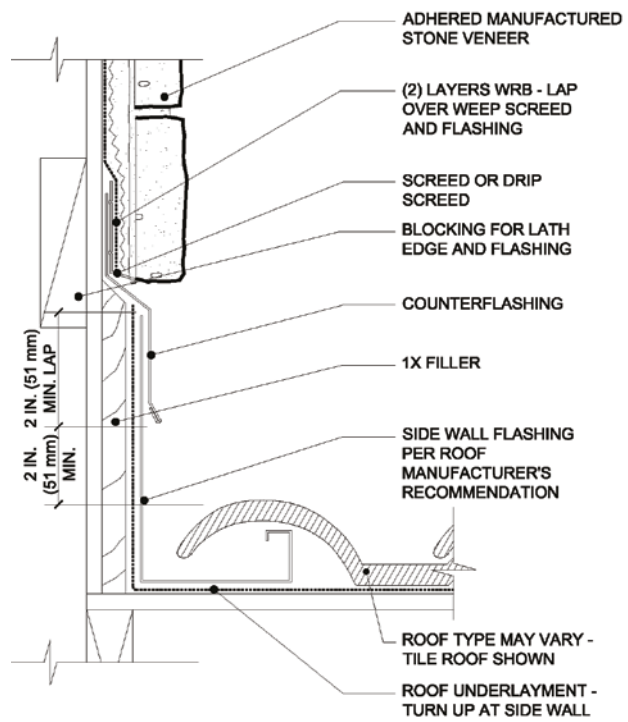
SIDE WALL-TILE ROOFING CURBING
